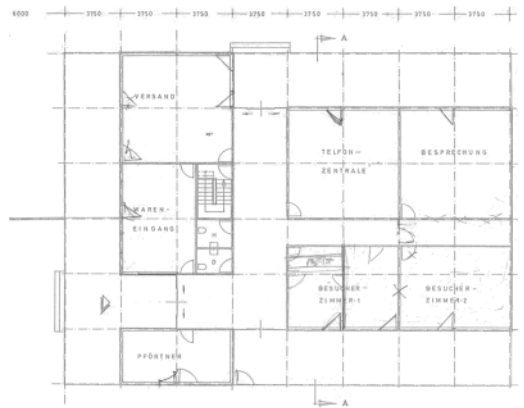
Layout of the pavilion after translocation in 1971, window openings drawn by hand, oriented to south. (Josef Gartner & Co. 1970).
